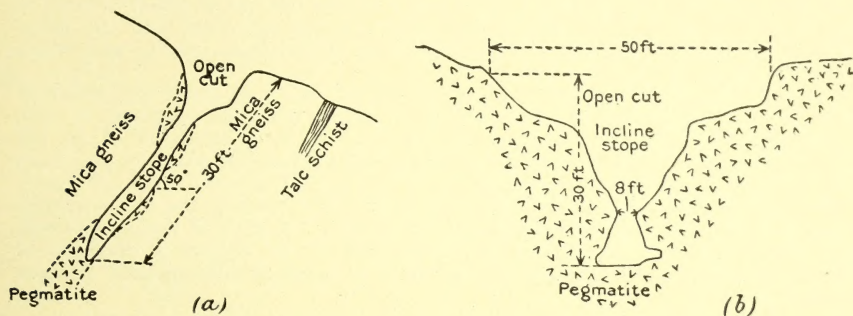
Jim Wood mine, Jackson County, N. C. (a) Cross section, (b) section in plane of the "vein."
